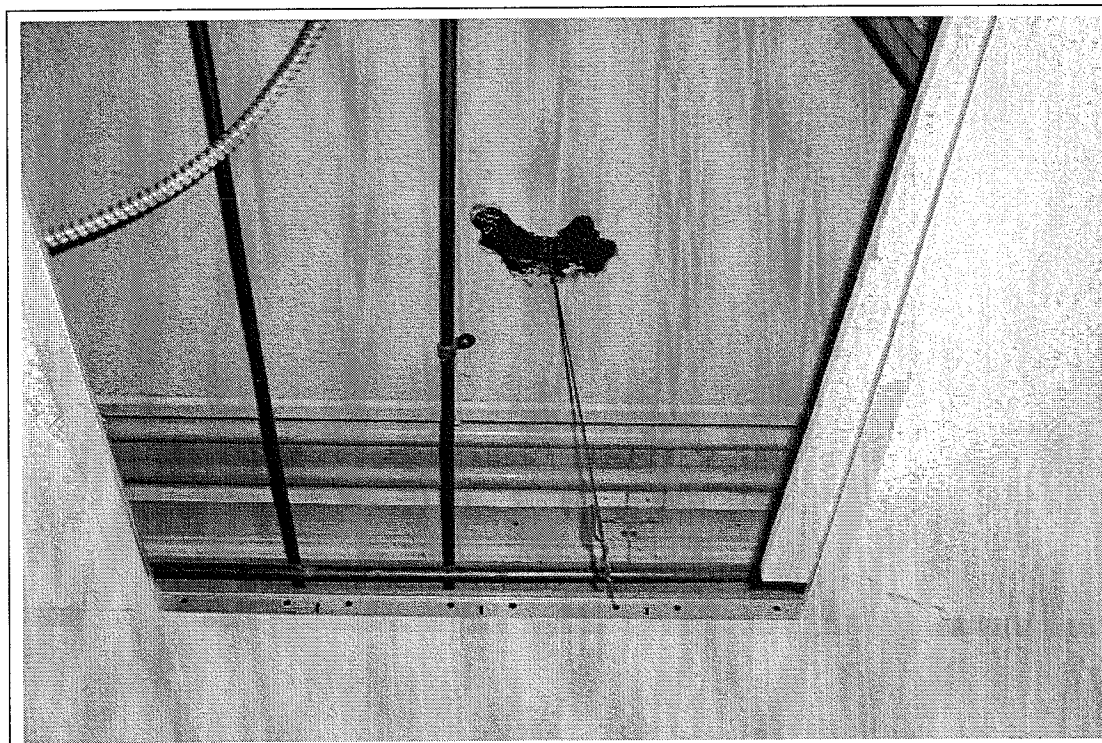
1st floor, City Counsel Chambers - View of acoustical plaster ceiling located above suspended ceiling
